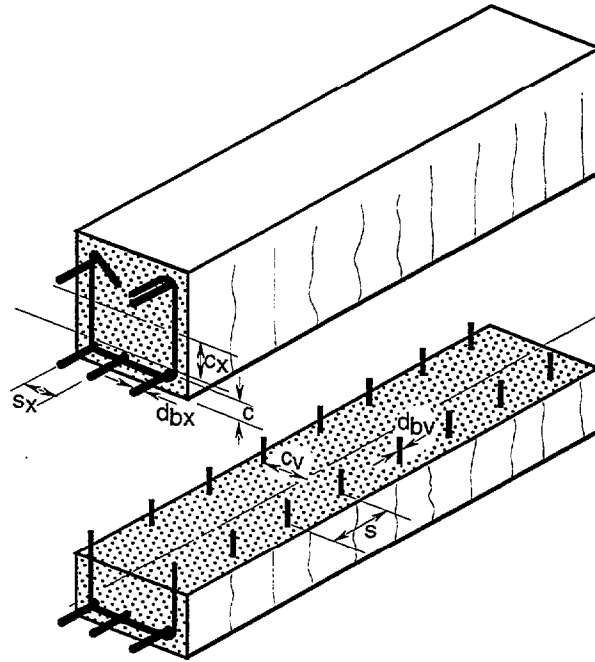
Parameters affecting crack spacing (Collins and Mitchell 1991).
